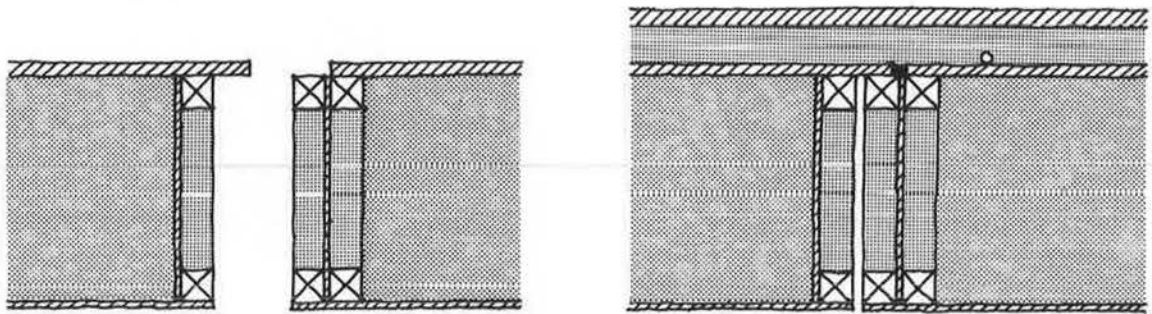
Vertical cross section of two floor elements, before and after joining (vapour barrier not shown).
